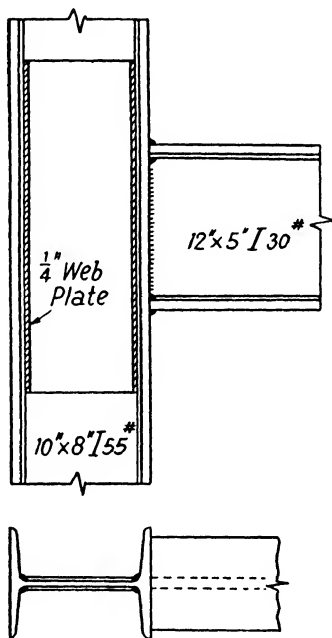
RIGID BEAM-TO-COLUMN CONNECTION FOR OUTSIDE COLUMN
